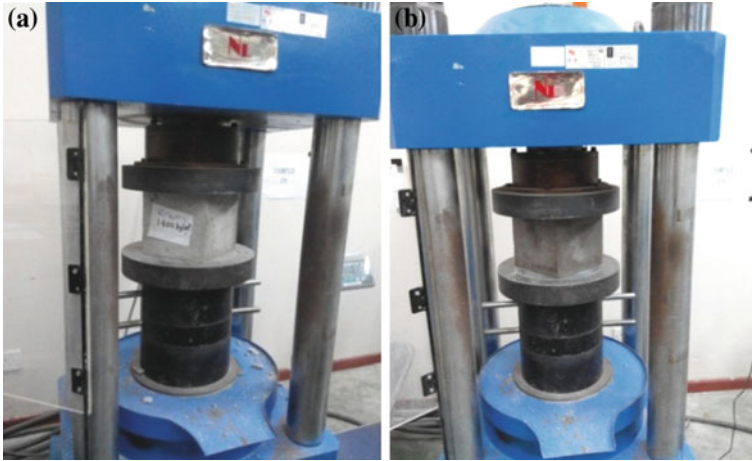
Compression test: a foamed concrete and b normal concrete
